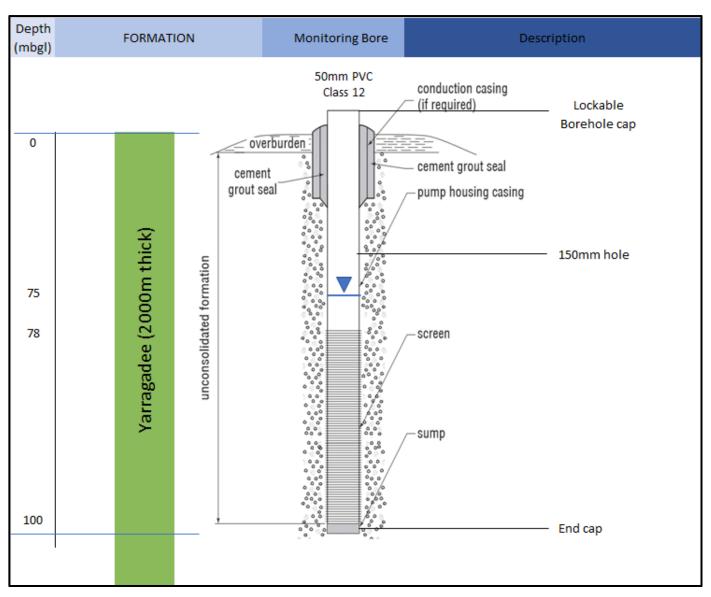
Proposed monitoring borehole construction (adapted from Minimum Construction Requirements for Water Bores in Australia, 2012)
